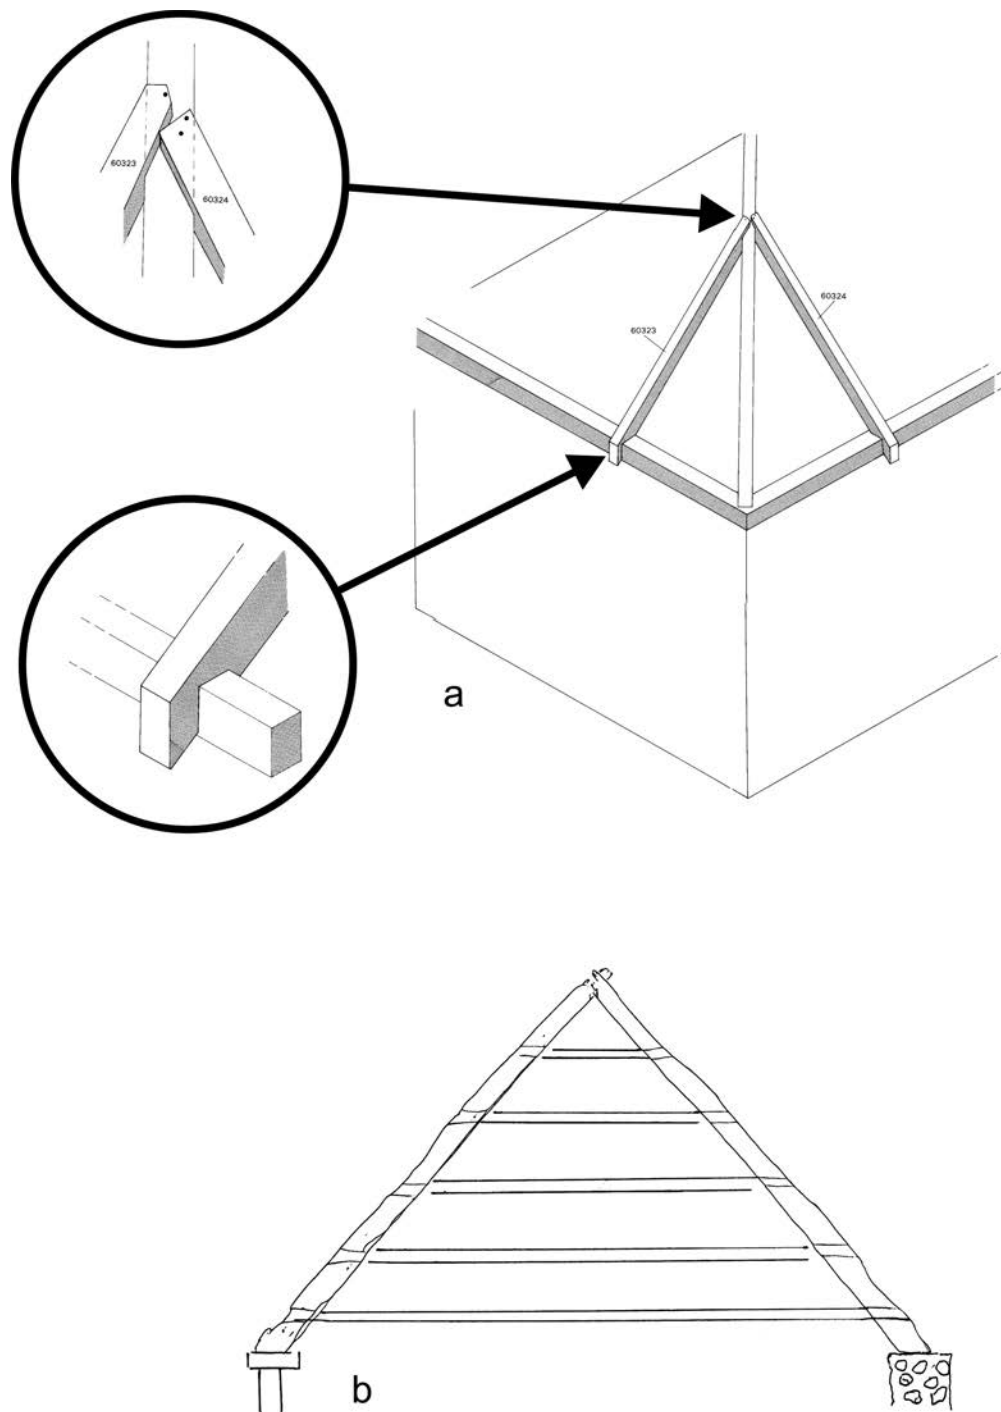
Area 6: reconstructions of roof timber carpentry: a – jack rafters; b – principal rafters
